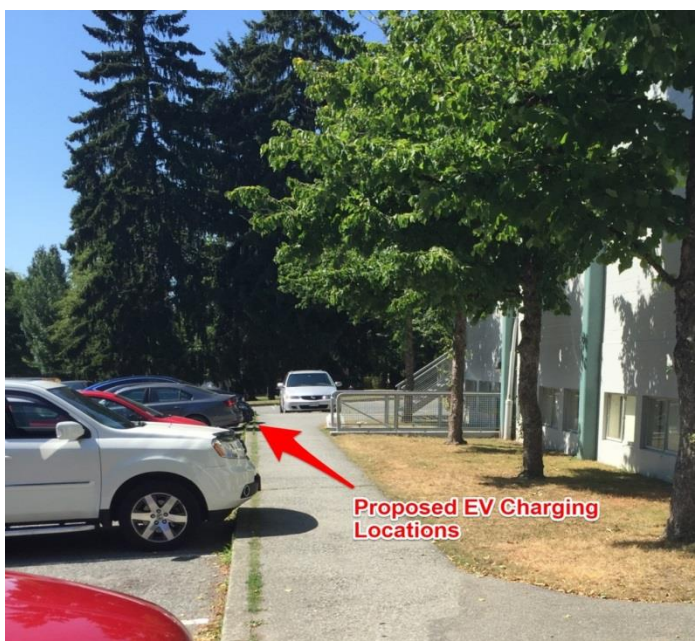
(left) - Photo of community Centre parking area (facing northwest). Proposed location of EV charging infrastructure is indicated in red.
